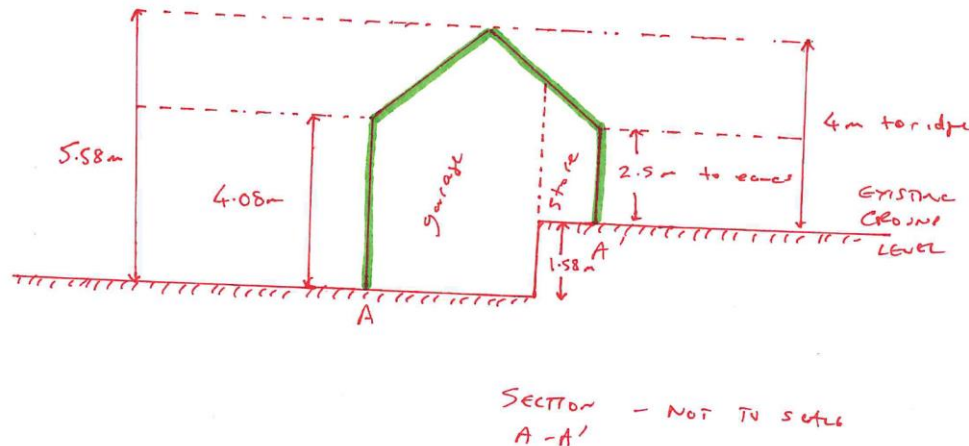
North to south cross section of Permitted Development fall back built onto the hill to the north
